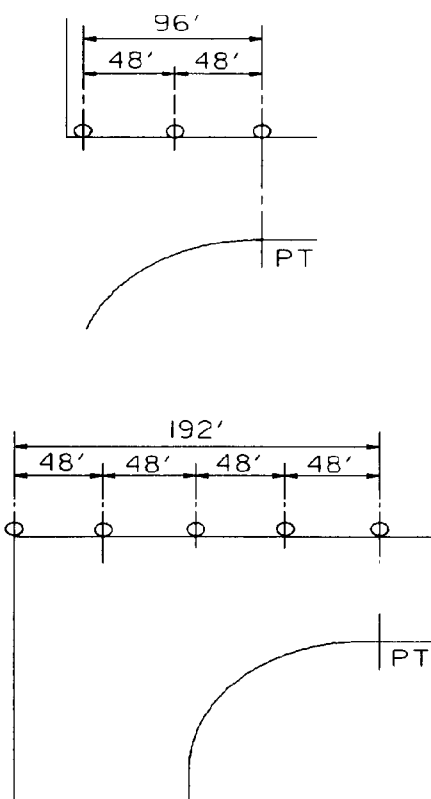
Typical examples single straight edge-less than 200 feet.
